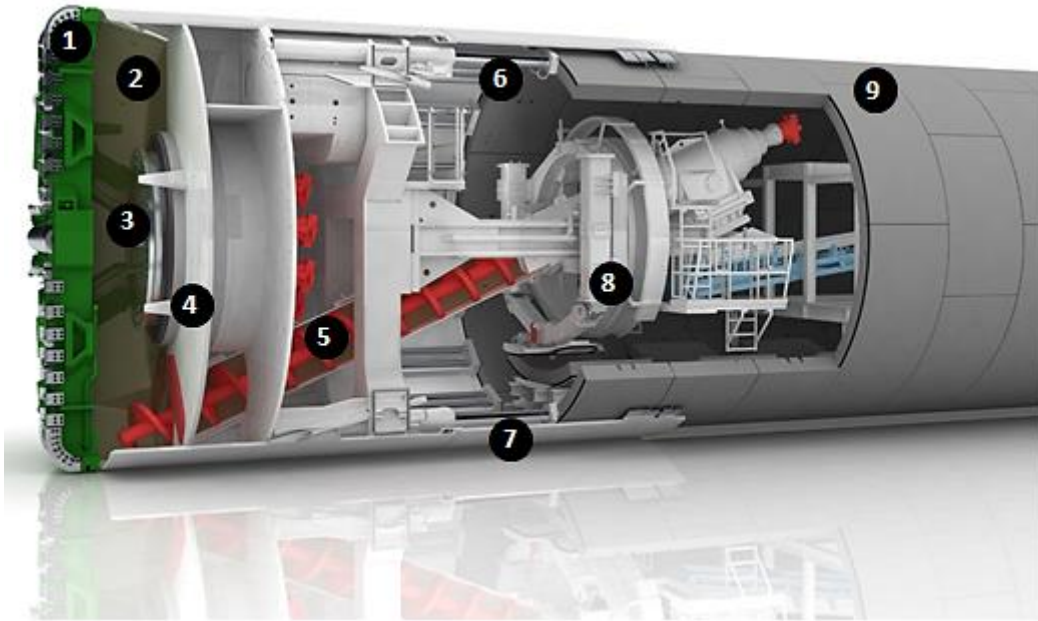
Illustration of a typical longitudinal section of an EPB machine: 1) Cutter head; 2) Excavation chamber; 3) Rotor; 4) Pressure bulkhead; 5) Screw conveyor; 6) Thrust cylinders; 7) Shield skin; 8) Erector; 9) Segmental lining (www.herrenknecht.com)
